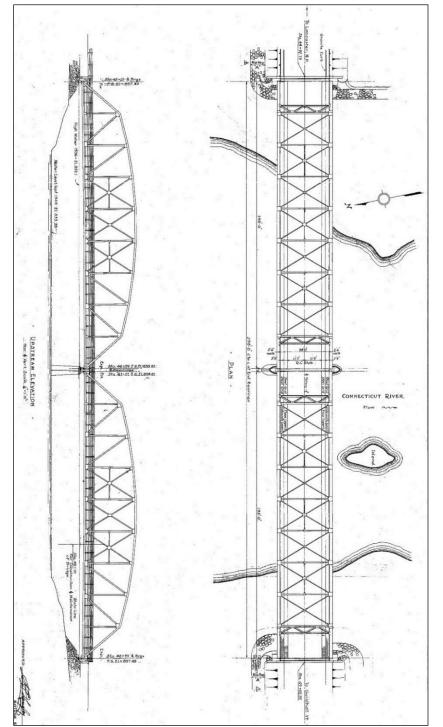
General Plan and Elevation. From original NHHD plans (File 2-10-1-1) Sheet 1 of 10, dated March 1946. Source: NHDOT, Original Plans.
